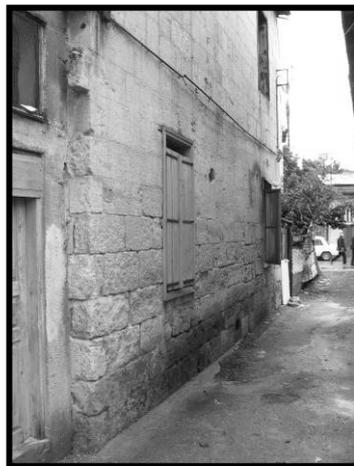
Cut stone wall masonry with lime mortar at the west façade
